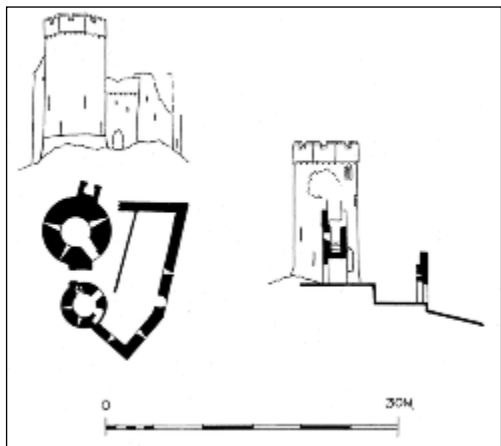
Benton Castle: plan, elevation and section, intended to show condition prior to restoration, after plans in Pembrokeshire Record Office PCC/PL/1/212, with additional details from plan supplied by M. Sullivan. See also King, 1981.
